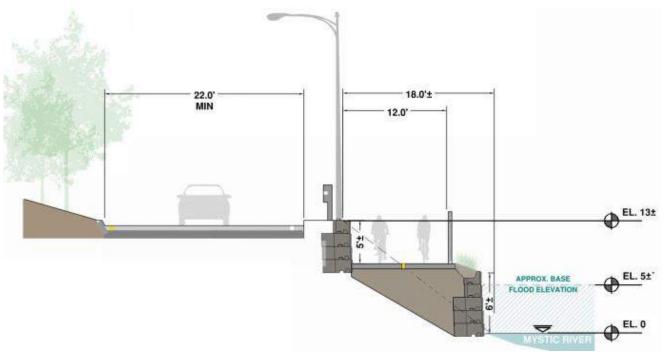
Section View of Alternative A5 - Ramp Open, Path Elevated with Mid-Height Retaining Wall Along Rt. 16
